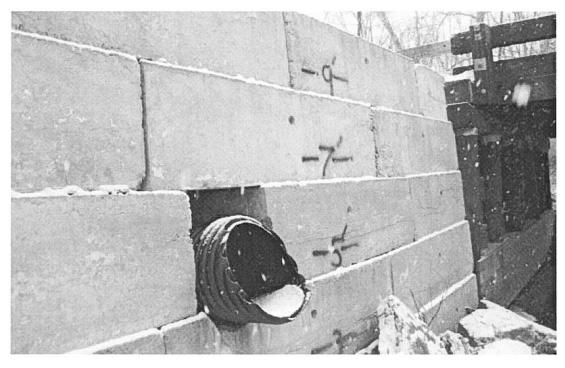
NE Wing wall constructed from Concrete "Mafia" Blocks
